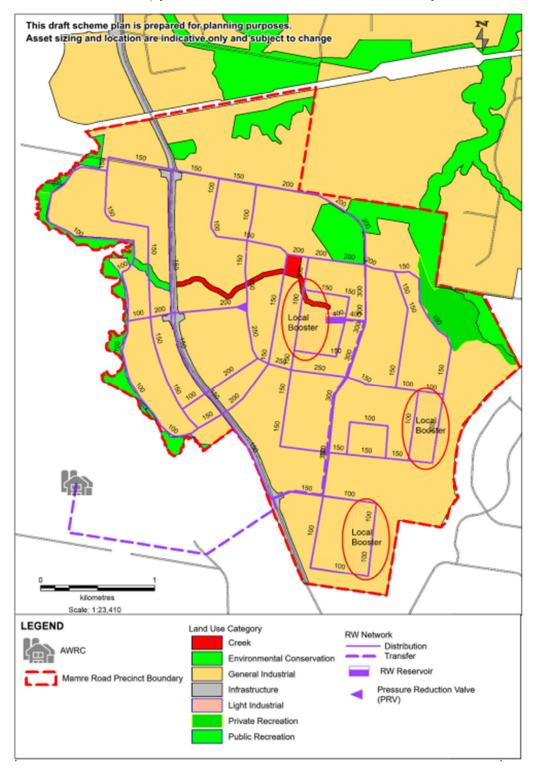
Draft Mamre Road Recycled Water Scheme Plan
